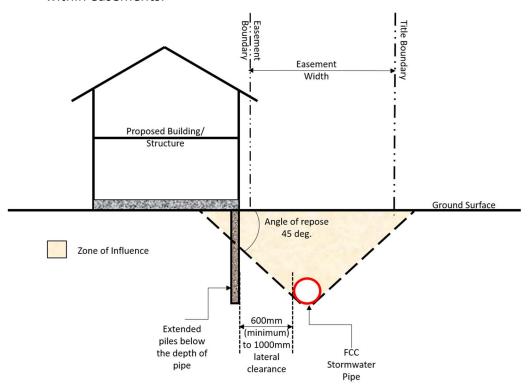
Section through building and stormwater pipe (600mm < lateral clearance < 1000mm)
